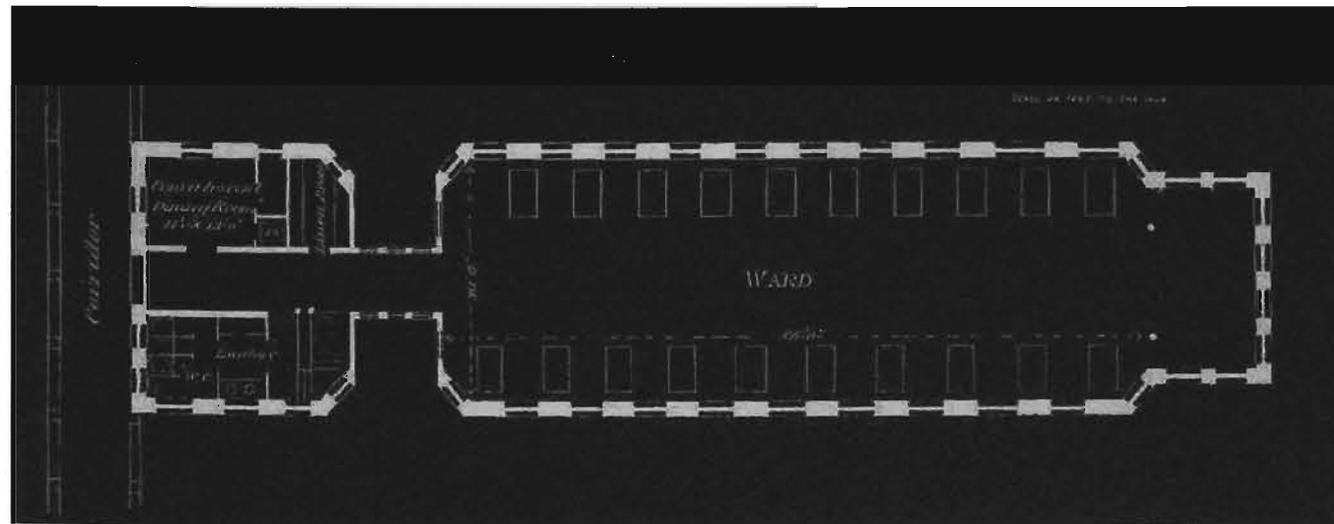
Johns Hopkins, boys Ward Floor plan 1885
